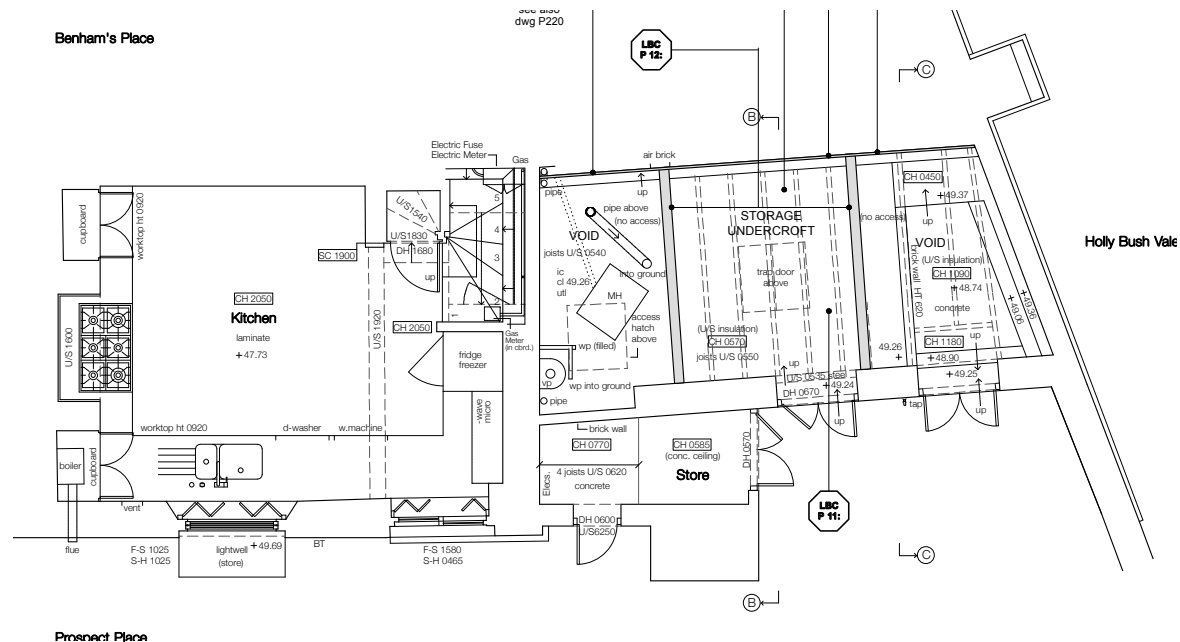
Approved lower ground floor plan from Listed Building Consent Ref 2017/2595/L.
